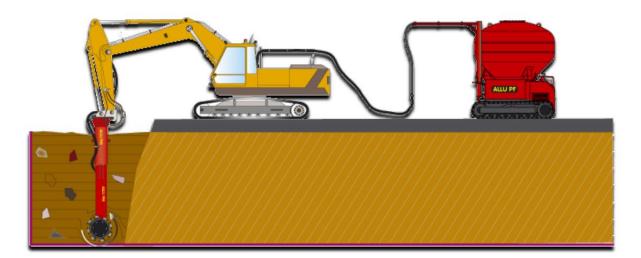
An illustration of soil mixing, with an excavator with a mixing head mixing the ground and blinder being pumped.
